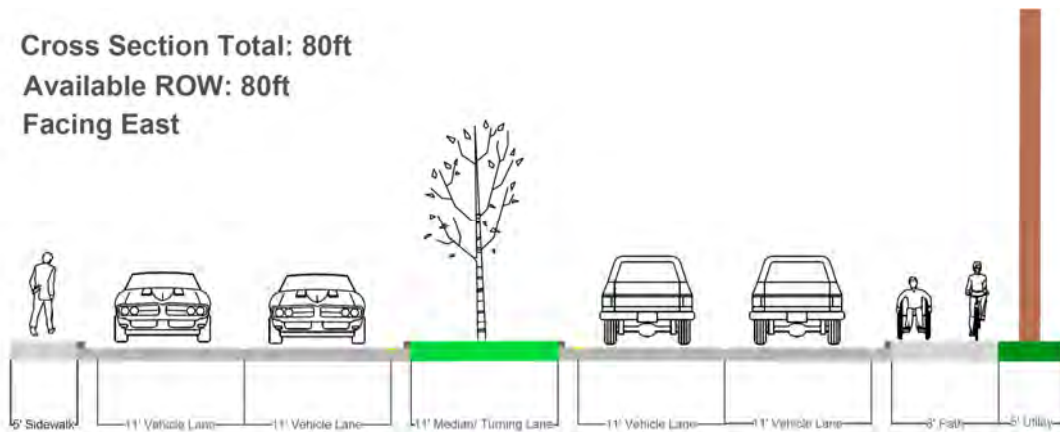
ROUTE 28 CENTERVILLE CROSS-SECTION - OPTION 2B
